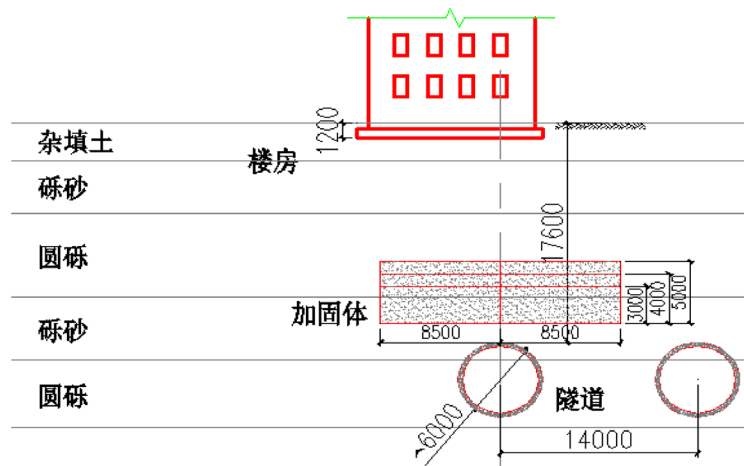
Thickness of Grouting Reinforcement Area above Tunnel (unit: mm)
